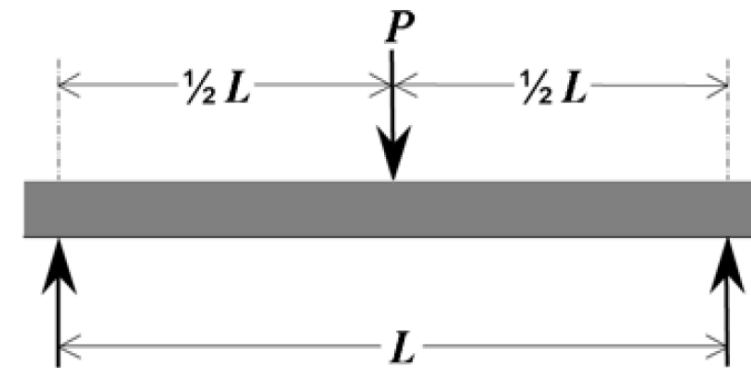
Test configuration used to determine the bending strength of the timber specimens (from ASTM 198 – 05A).
